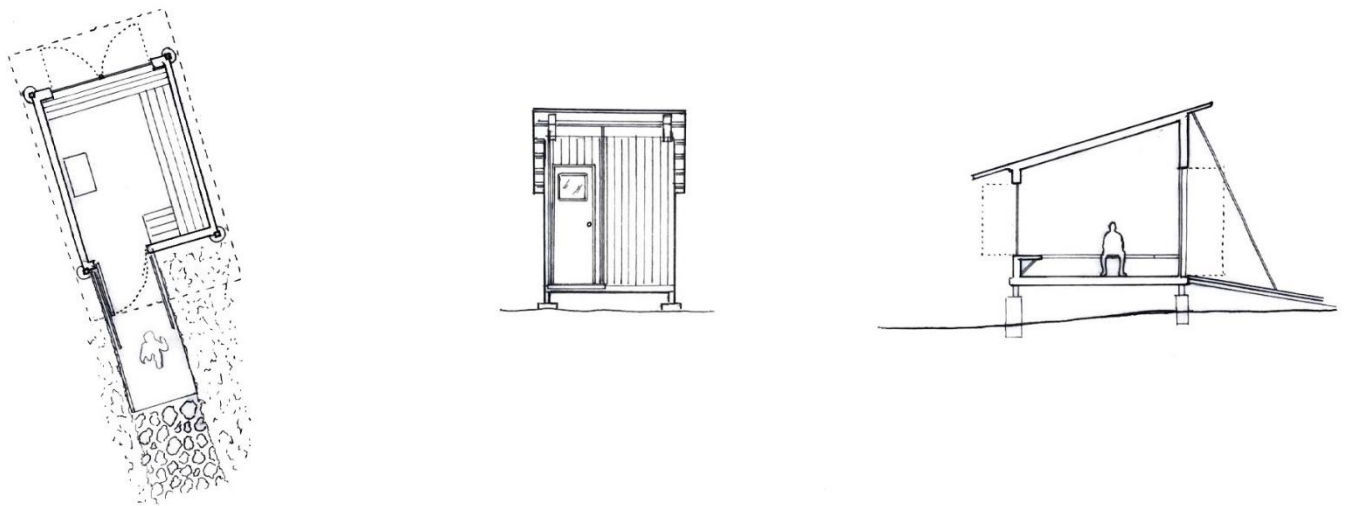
Sauna Plan, Elevation, Section (source: Author)
